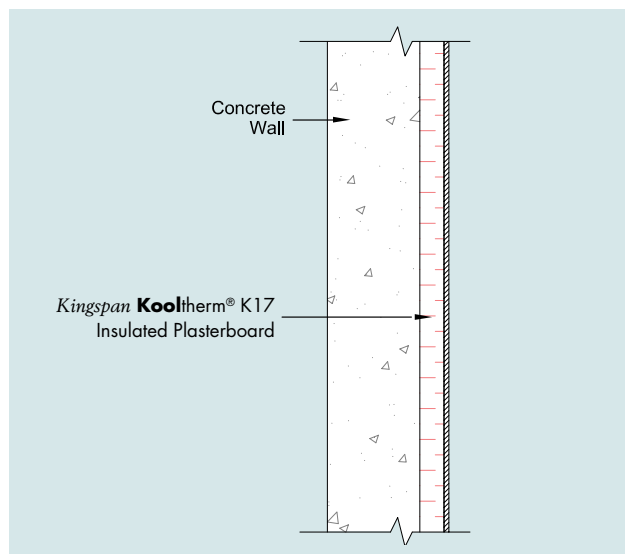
Side elevation of *Kingspan Kooltherm® K17 Insulated Plasterboard* bonded to a concrete wall
